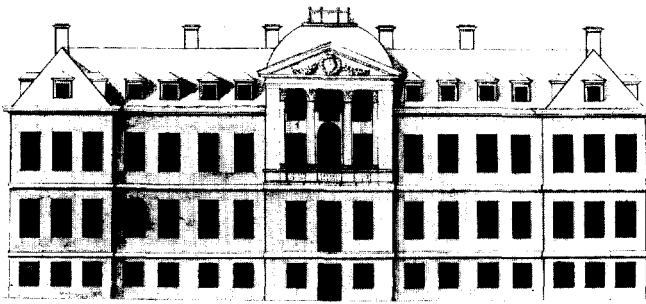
Robert Hooke. Bloomsbury, London, Montagu House, 1674-7. First design. W. Morgan. *London &c. actually survey'd*, 1682. Guildhall Library, Corporation of London.
